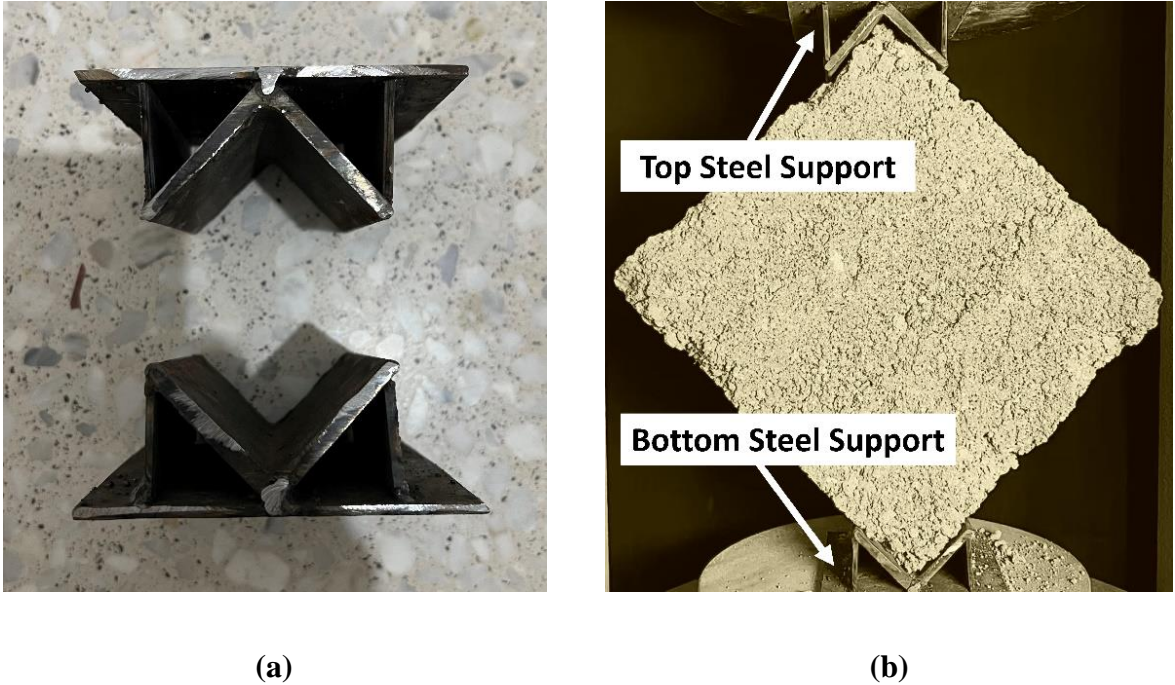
The manufactured steel supports (a) and the adopted experimental set-up (b)
